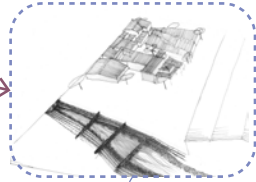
(left) Ground Floor Plan (Patrick: 2016)
